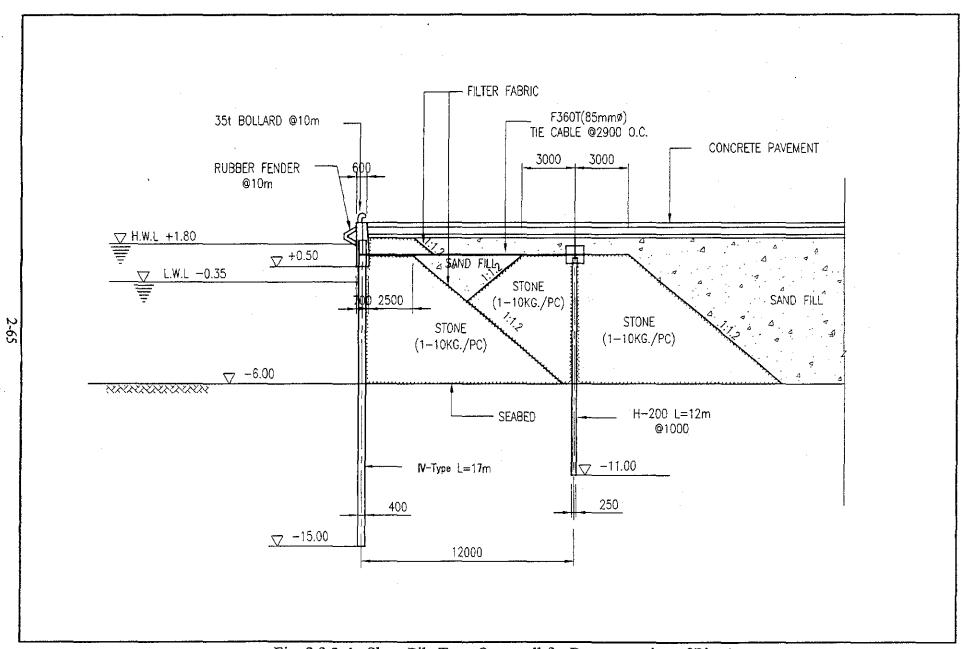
Sheet Pile Type Quaywall for Reconstruction of Pier 1
